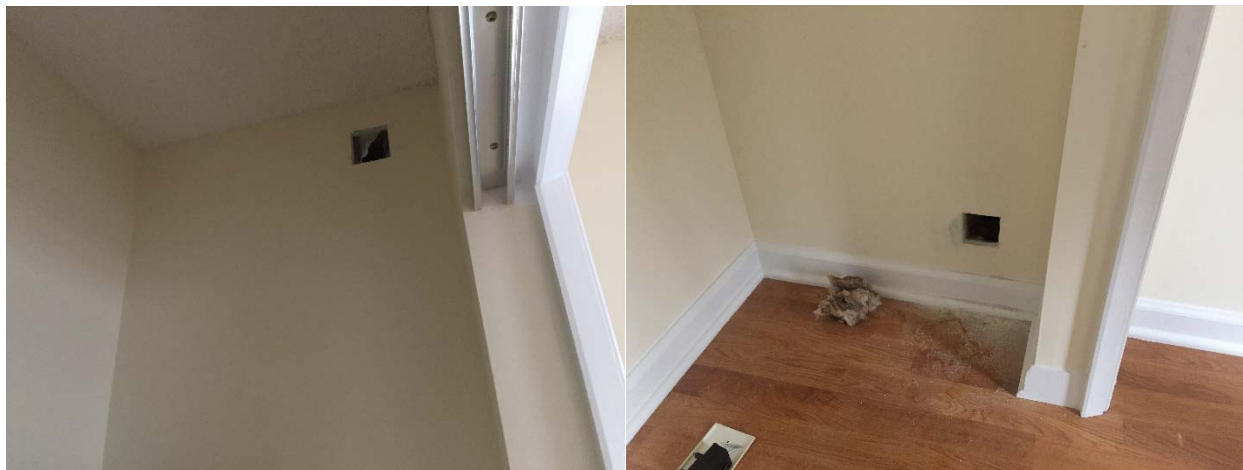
Typical moisture sensor installation in a frame wall showing top and bottom stud cavity locations
